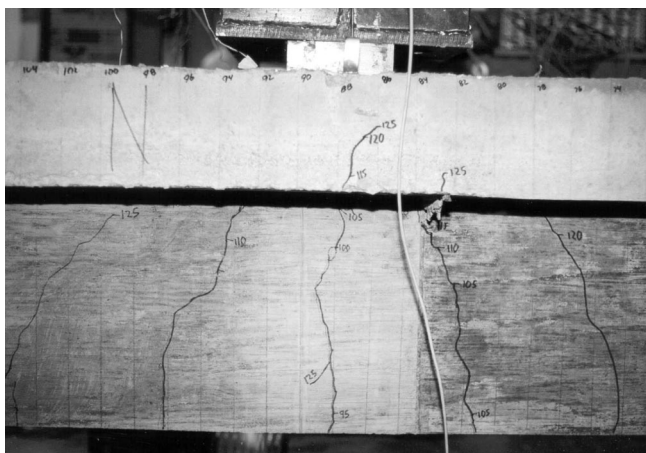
Multiple-strand development length specimen HPC-2 before failure (north face).
